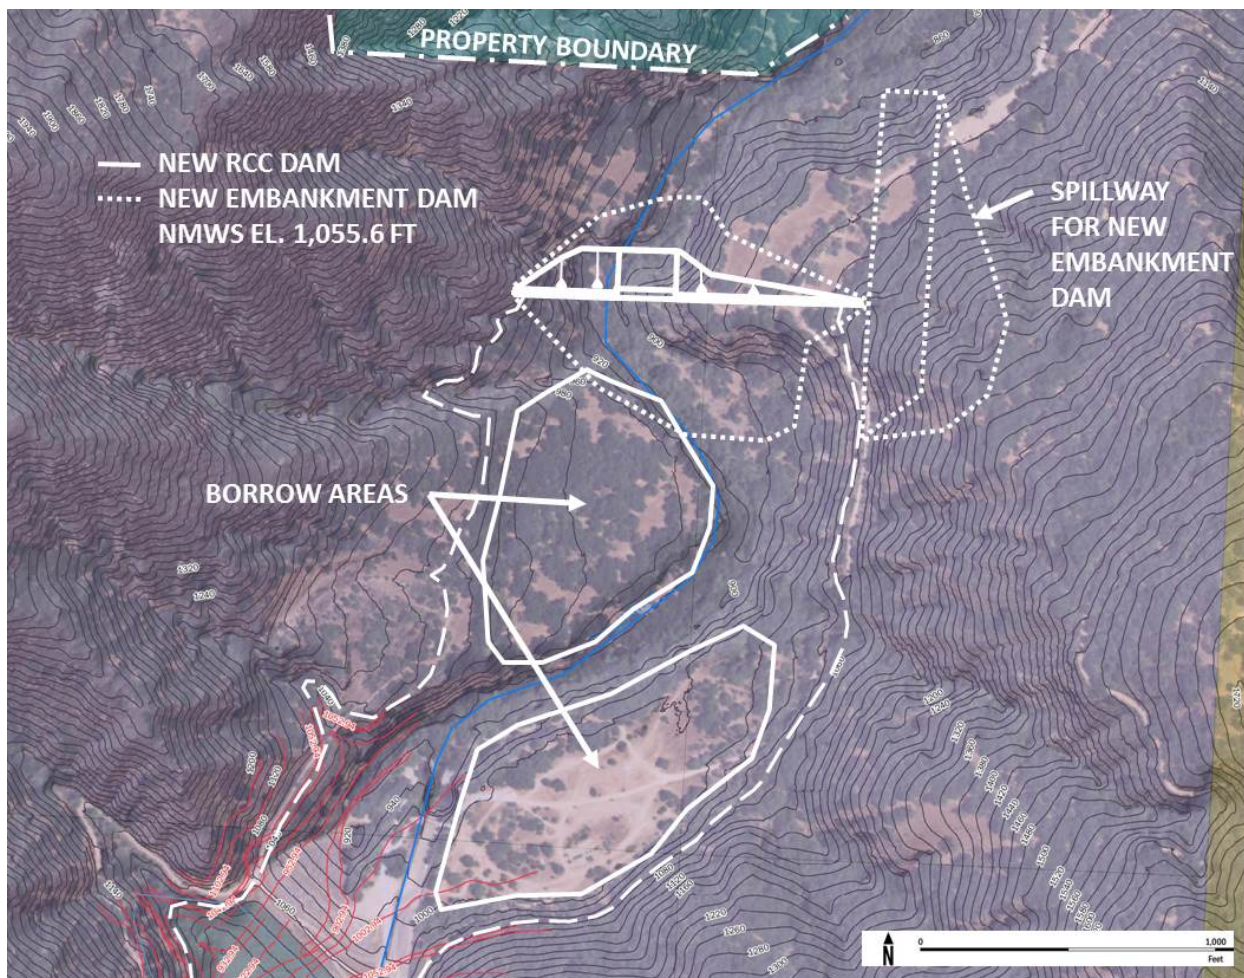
Alternative 4c New Downstream Dam Concept Plan
